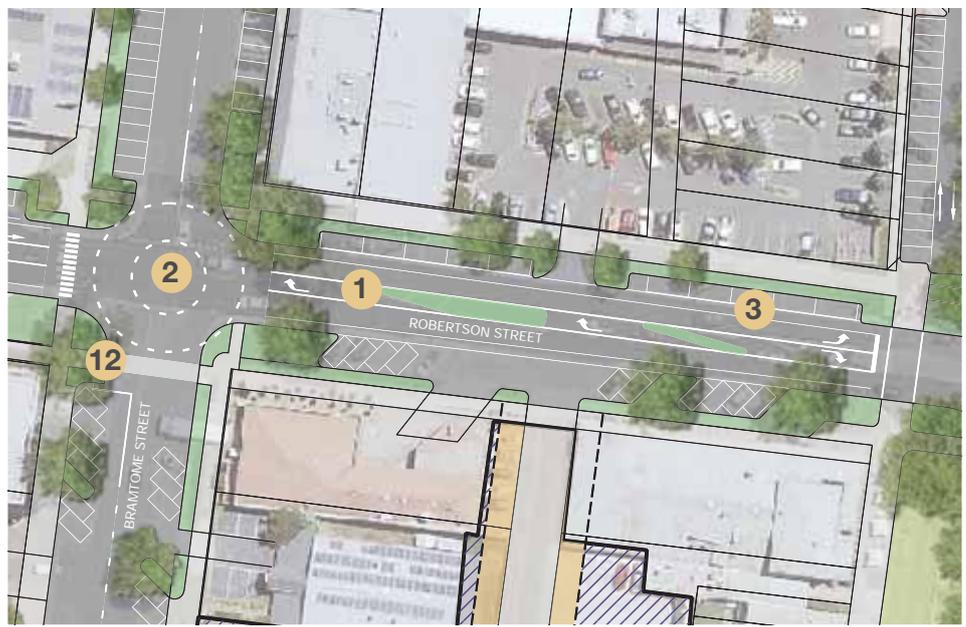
Robertson Street Concept Plan (between Brantome & Aitken Streets)
